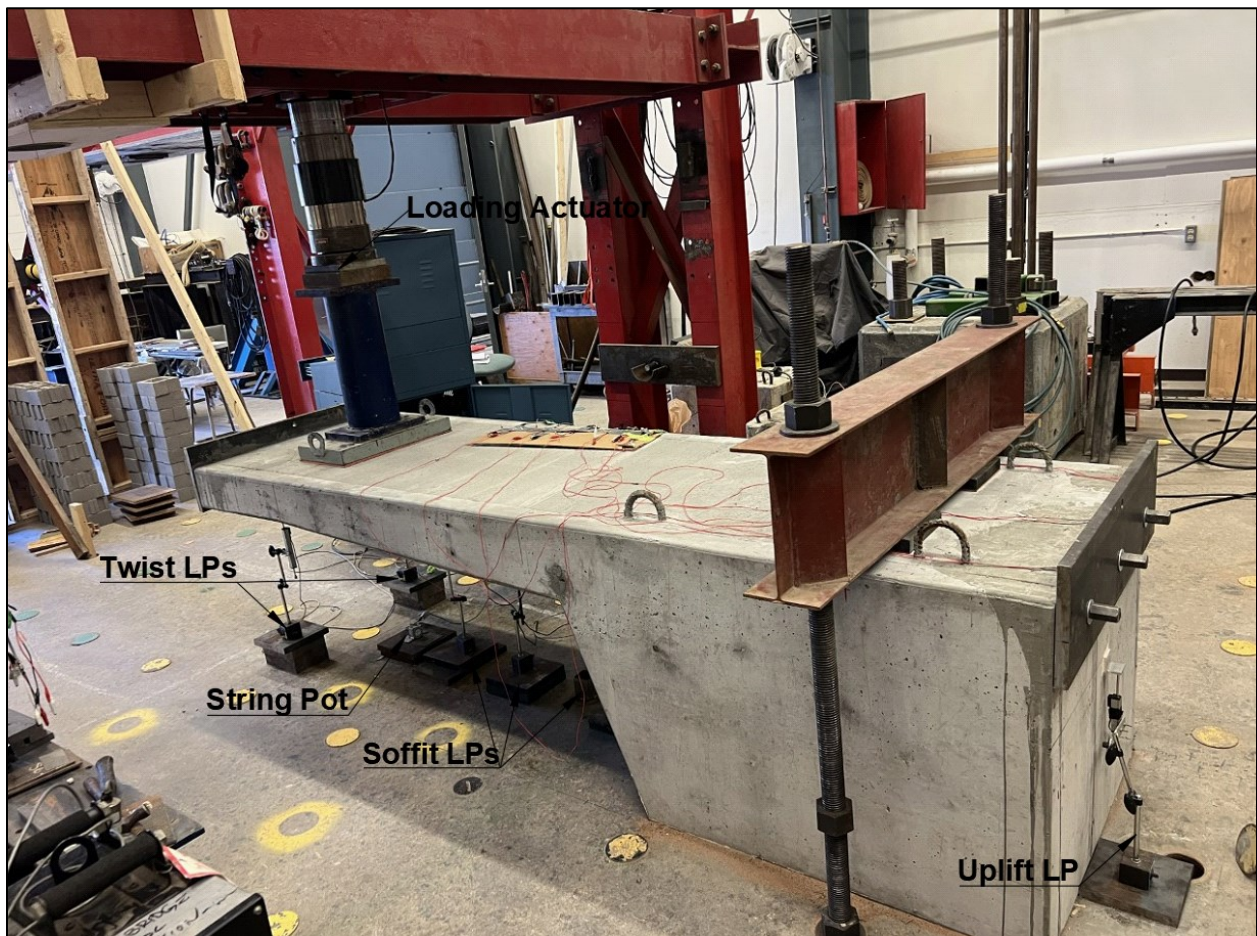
Bridge Cantilever Specimen Instrumentation Layout
